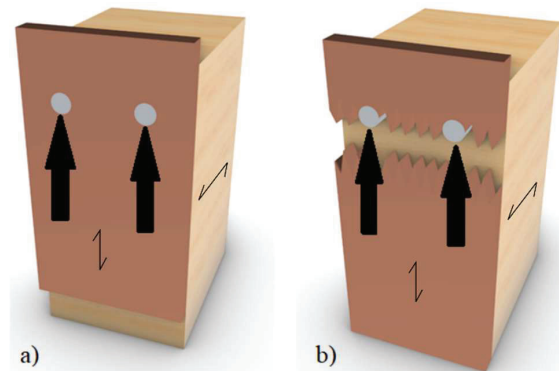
Failure mechanisms of the end-grain bonded plywood reinforcement a) bond line shear failure b) tensile failure
